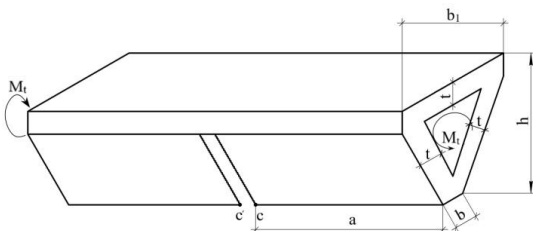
The scheme of a hollow triangular section element with a normal crack
